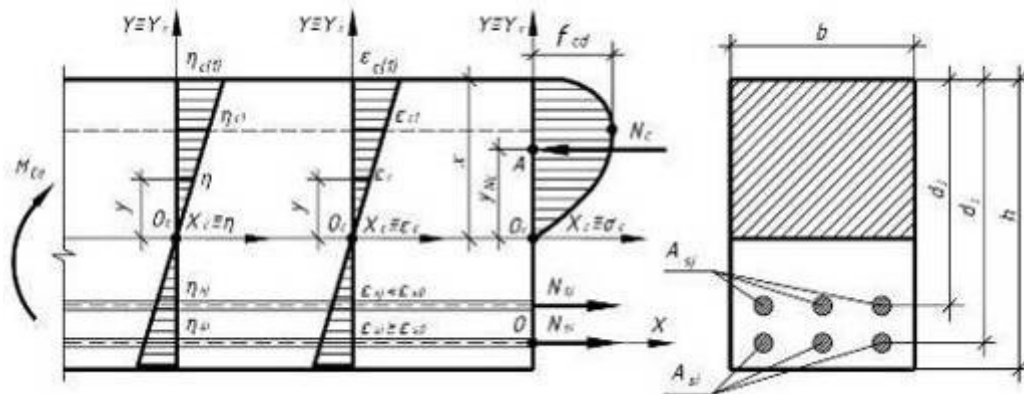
Design scheme of the reinforced concrete beam with multi-row arrangement of tensile reinforcement
